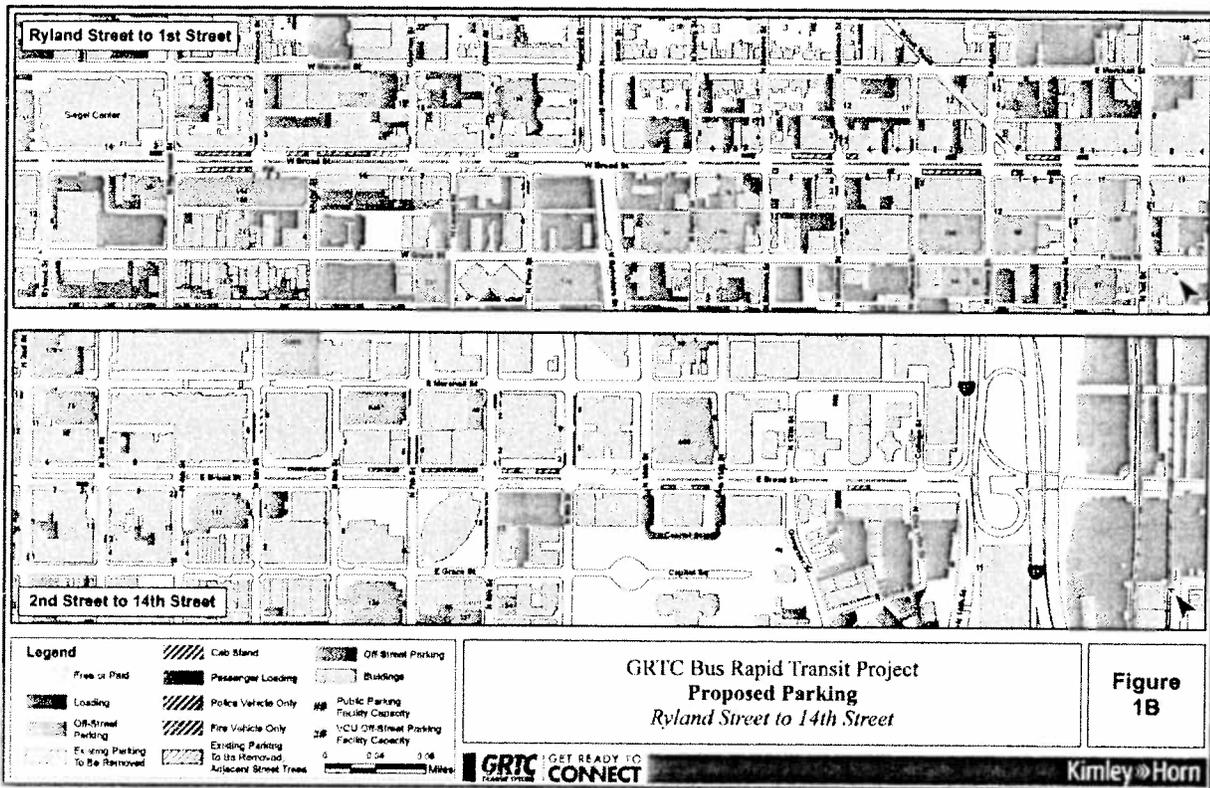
B - PROPOSED PARKING WITH EXISTING STREET TREES INDICATED WHERE PARKING IS TO BE REMOVED, RYLAND STREET TO 14TH STREET
